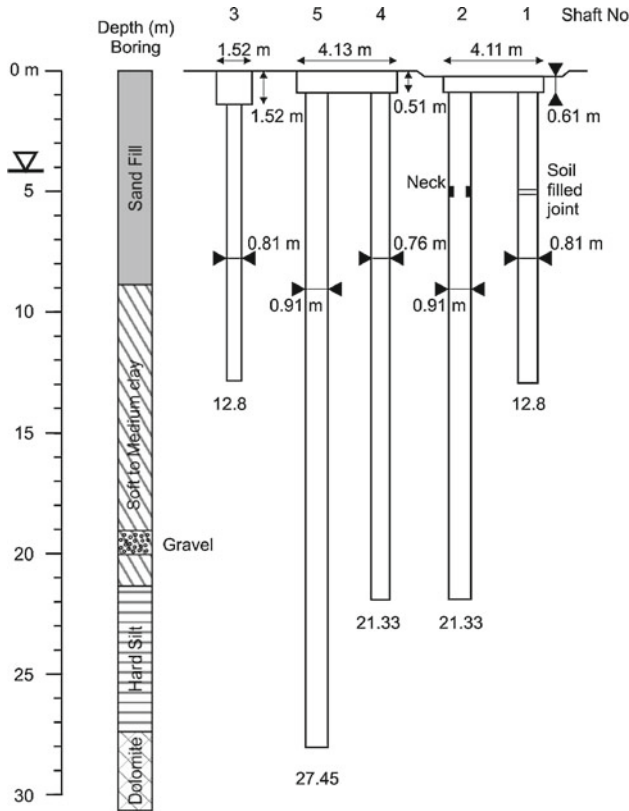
Cross-section of NGES deep foundation test site (after [Gassman and Finno, 2000])
